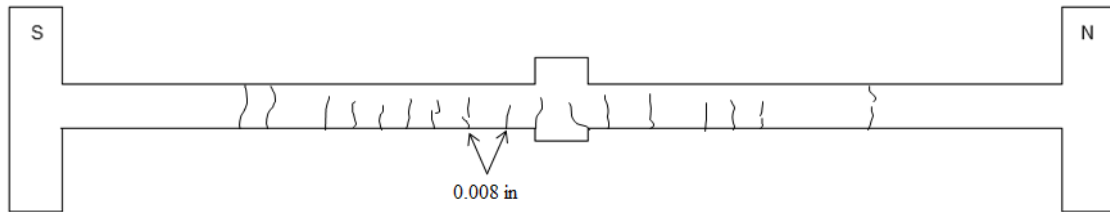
Crack pattern of Specimen 1 formed by the self-weight of the specimen during handling and positioning, and by weight of loading beam (crack widths not indicated are smaller than 0.008 in.)
